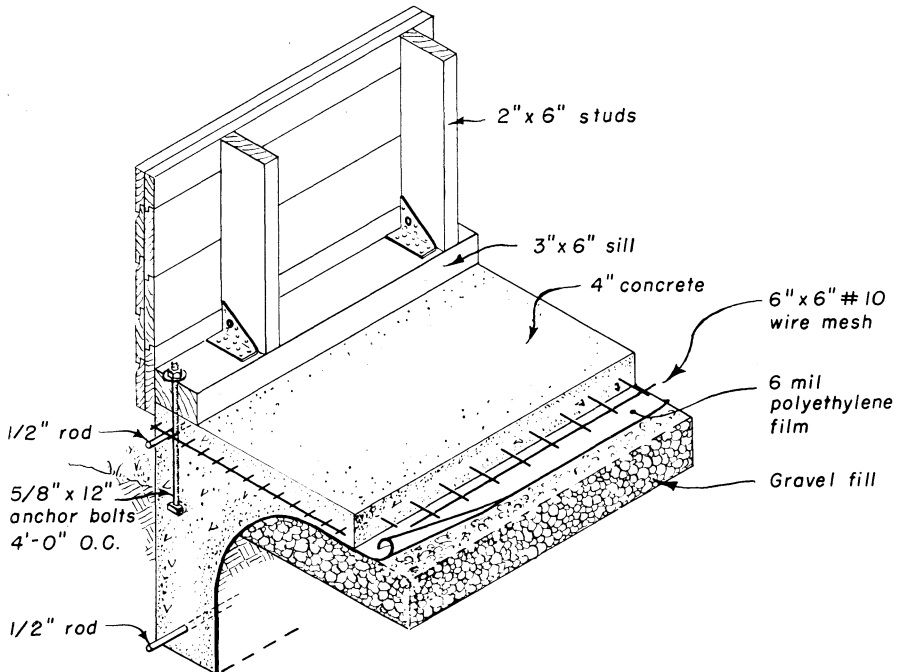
Concrete floor and foundation for a wood bin. Six mil polyethylene film or composition roofing (55-pound) is used as a moisture barrier. Note the anchor bolts, reinforcing rods, and wire mesh. The wall extends below the level of the floor surface. This floor and foundation can also be used for other types of construction.
